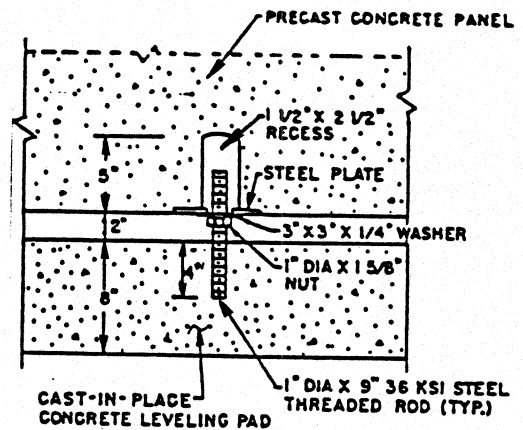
LEVELING BOLT FOR THE TANQUE VERDE ROAD PROJECT
